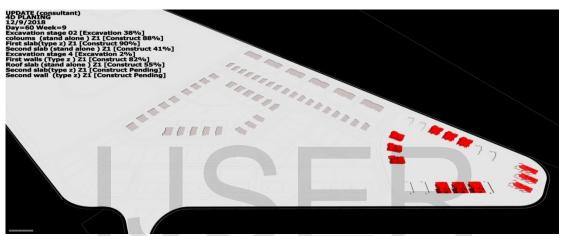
Day 60 in week 9 → excavation (38% stage 2 & 2% stage 4). →construction(88% Columns standalone Z1). →construction (90% first slab type z zone 1)&(41% second slab)
